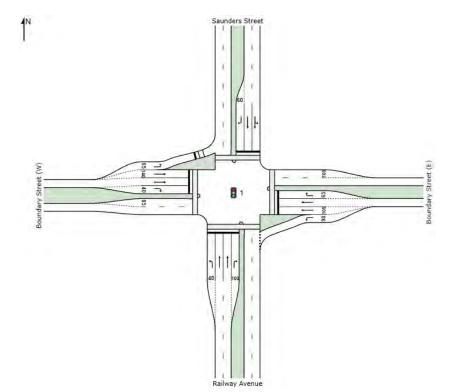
Railway Avenue, Boundary Street and Saunders Street existing layout as modelled
